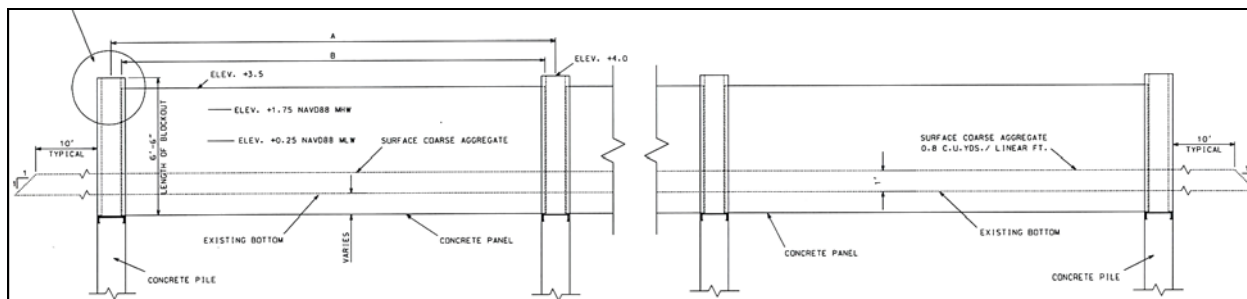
B: Typical drawing of concrete pile structure (NRCS 2004a).
